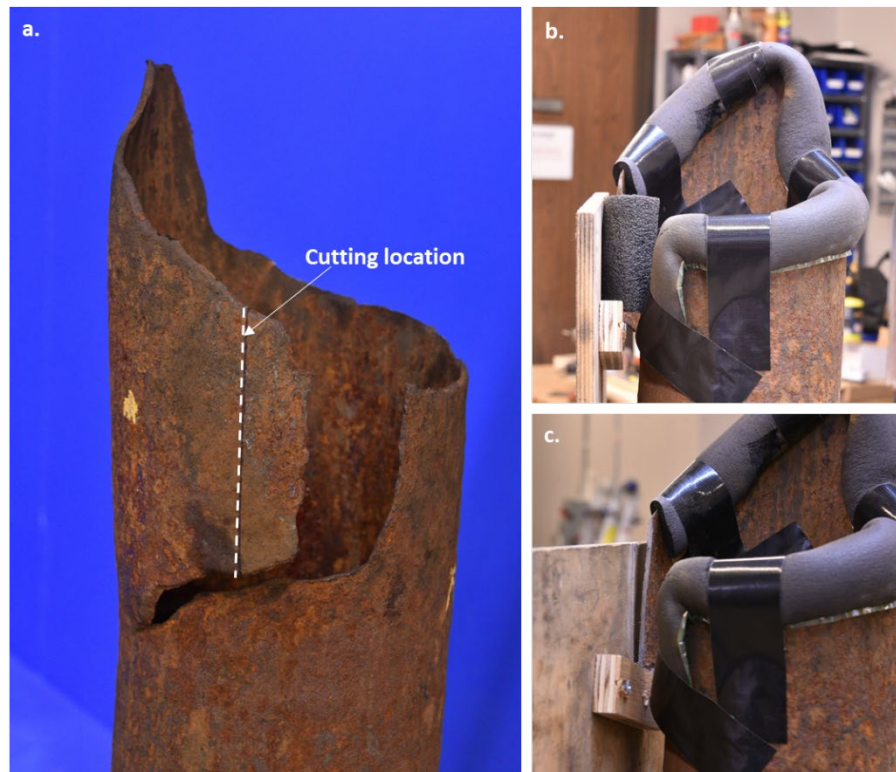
C001A-1 Axial Fracture Surface (a) Dashed Line Showing Cutting Location, (b) Protected Fracture Surface, and (c) After Cutting of Axial Fracture Surface C001A-1
